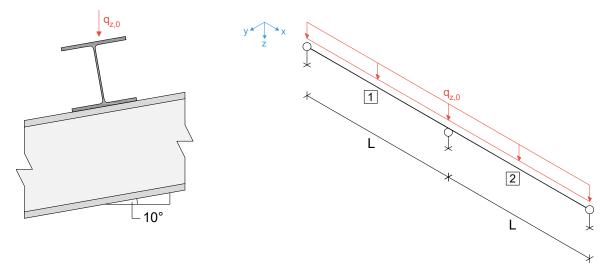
Two-Span Purlin resting on Inclined Rafters [5]
